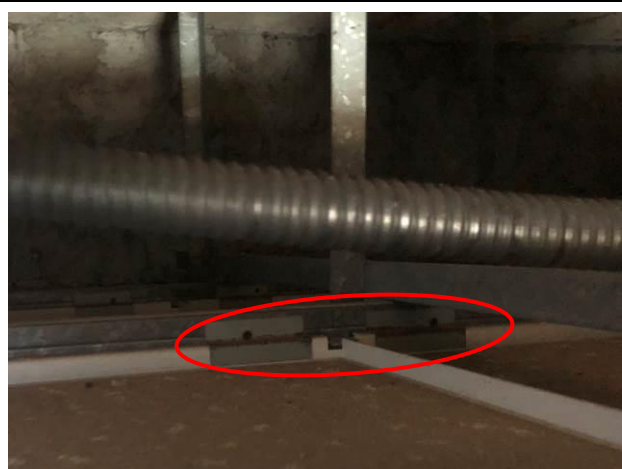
| Brackets connecting grid and ceiling panel were rusty.
